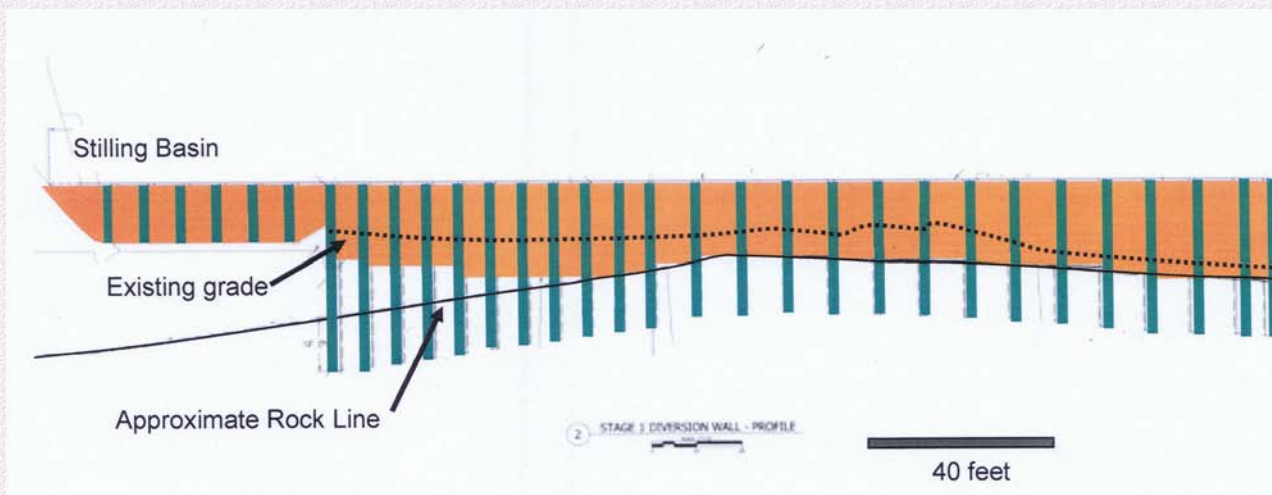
Profile of Stage 1 diversion wall showing soldier piles and steel lagging.
